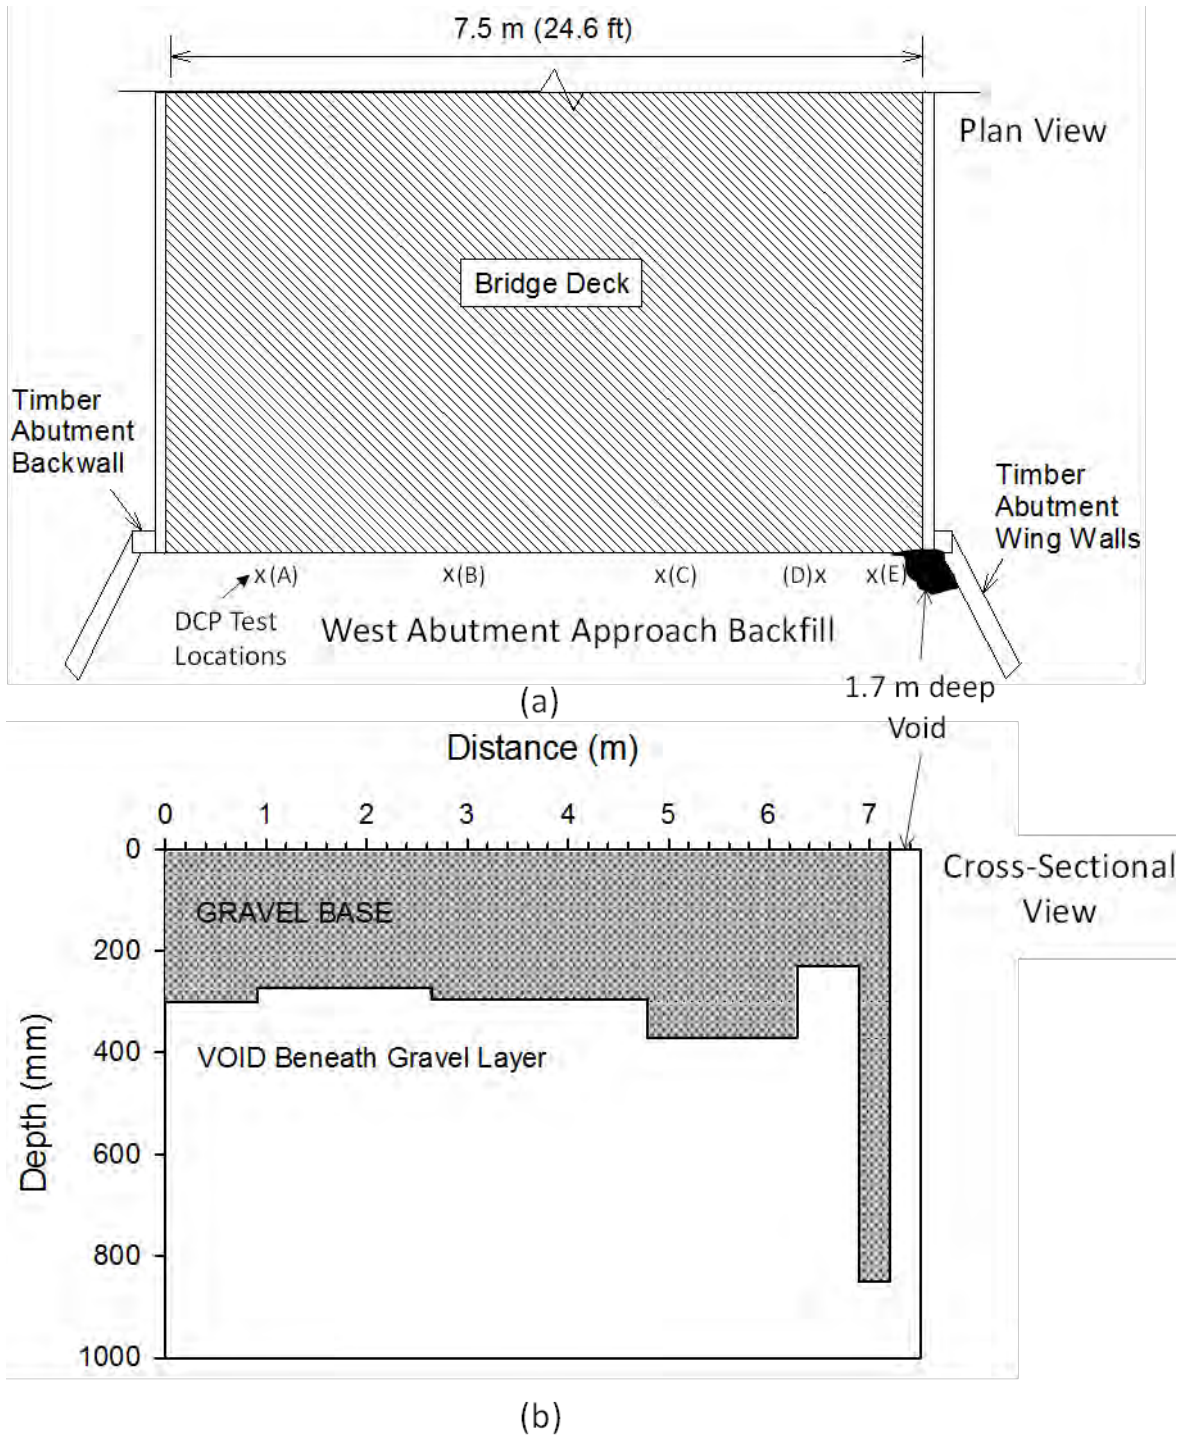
TS2 bridge approach: (a) Bridge deck plan view showing DCP test locations on the approach backfill, and (b) cross-sectional view showing thickness of gravel base and void beneath the gravel layer across the bridge (tests conducted on 10/25/11) – Fremont County
